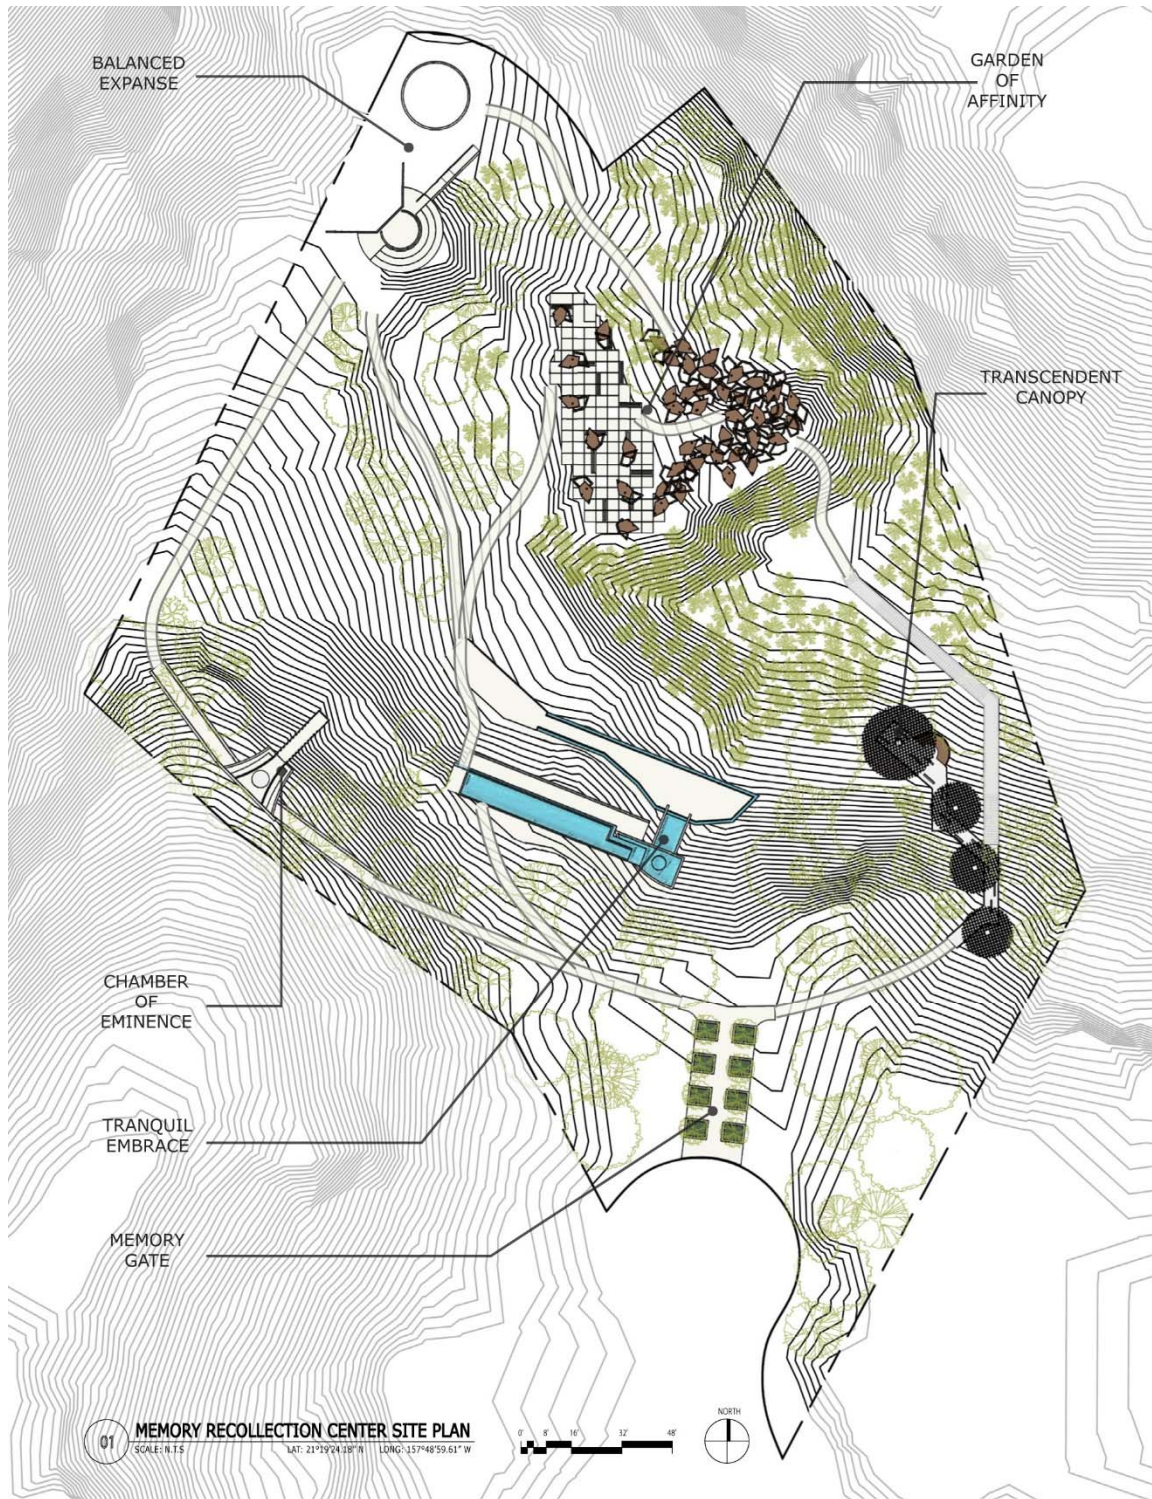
A Memory Recollection Center Final Design Site Plan. Made by Author.
